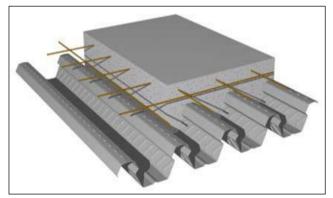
Composite slab consists of corrugated steel deck and reinforced concrete
